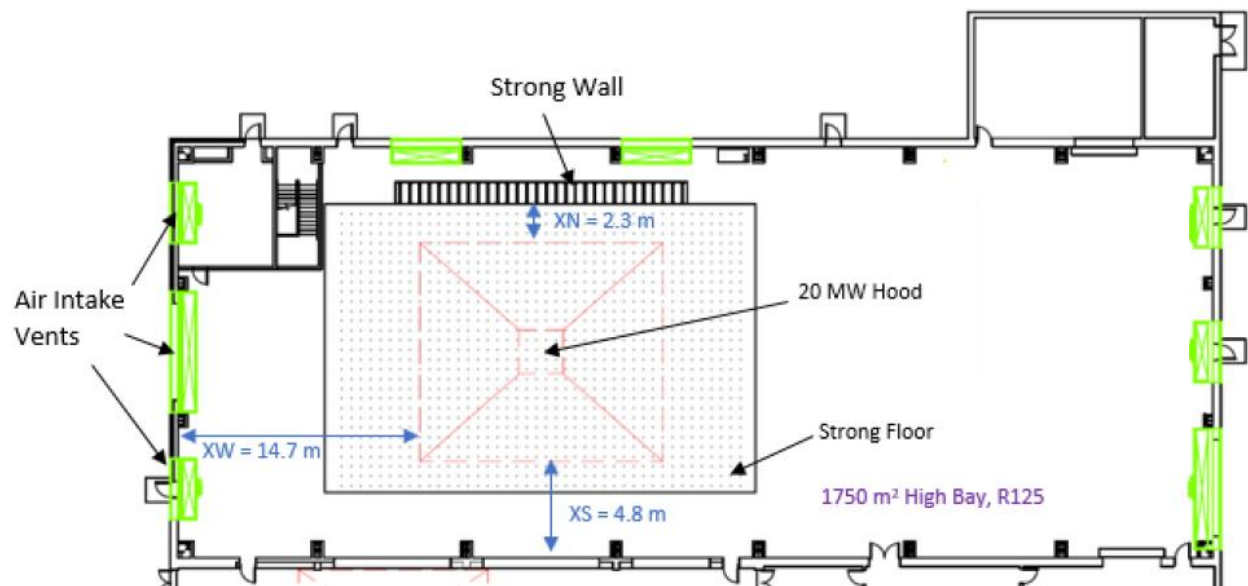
Floor plan of the National Fire Research Laboratory's Room 125, housing the 20 MW exhaust hood.
